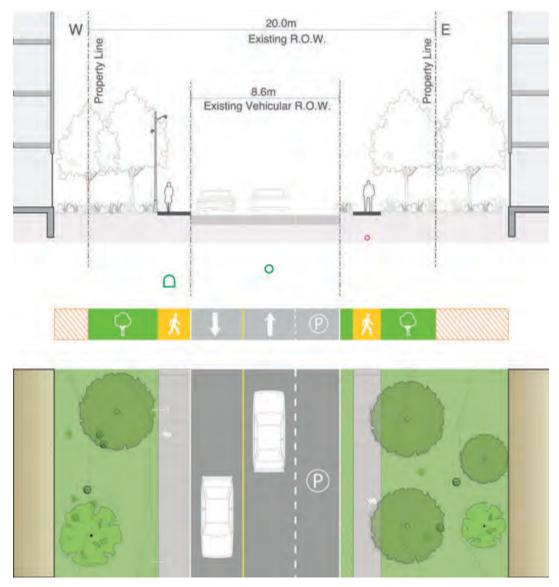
Section and Plan of the Existing Conditions along Pailton Crescent between Davisville Avenue and Balliol Street
